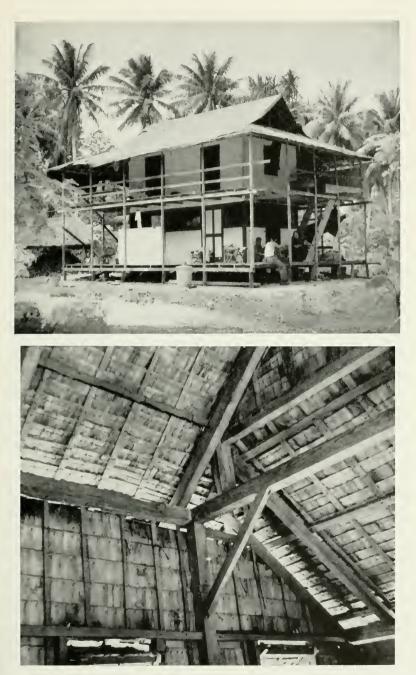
Upper: A new item in village architecture. Two-story house under construction. Lower: Interior of a thatch house, showing construction of roof and wall.
